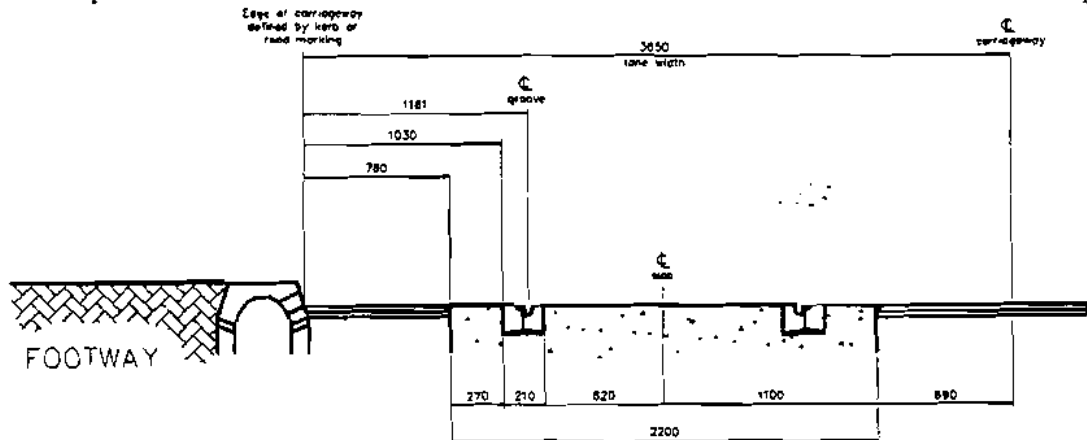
Typical section through straight carriageway lane showing positions of rails and slab.
